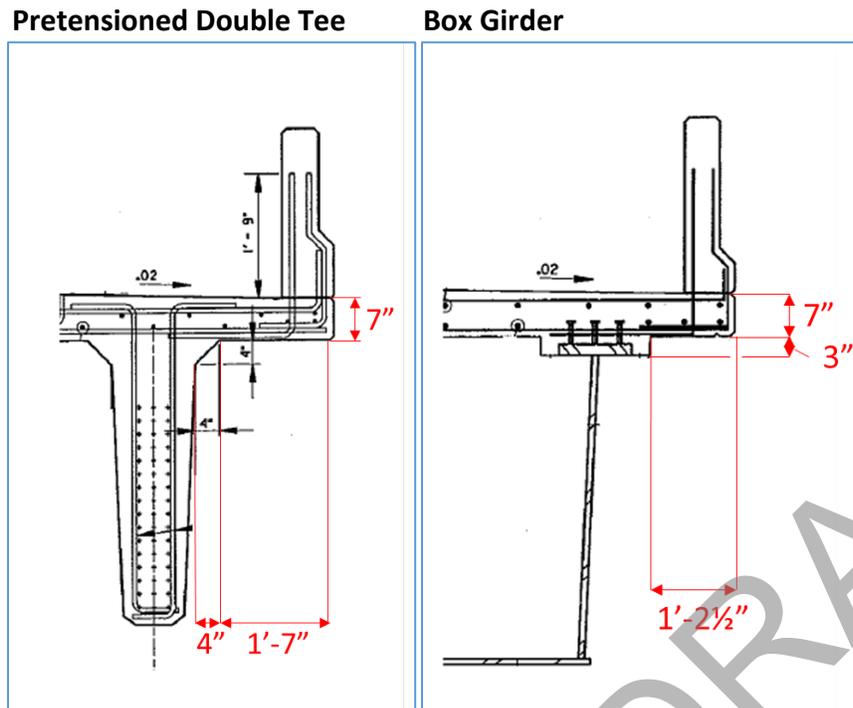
DECK SECTION DETAILS (SOUTH LINE AS-BUILTS)
